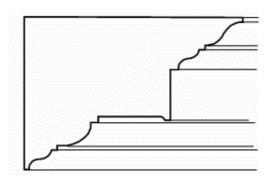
Timber box cornice first floor No.15 Elder Street, Spitalfields 1727 ((item 1 pg.169 Life in a Georgian City)
